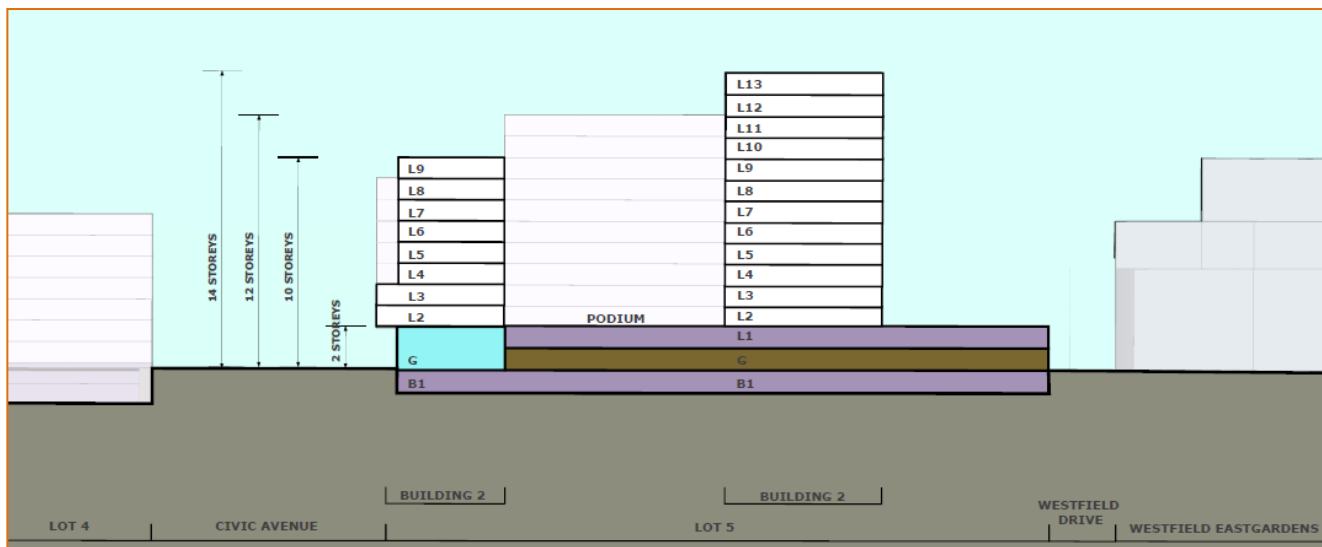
Built form Section with 5,000m<sup>2</sup> retail
